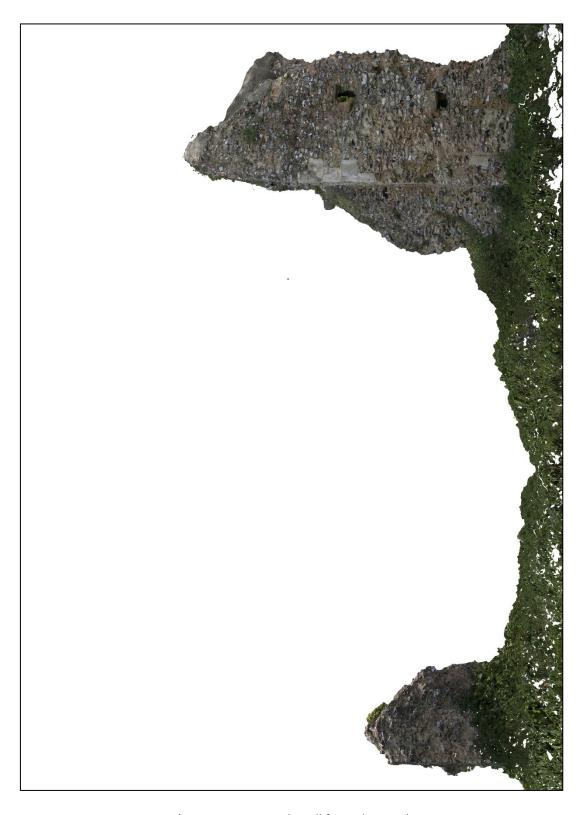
Nave north wall from the south *(Courtesy of SumoAerial-Cam)
